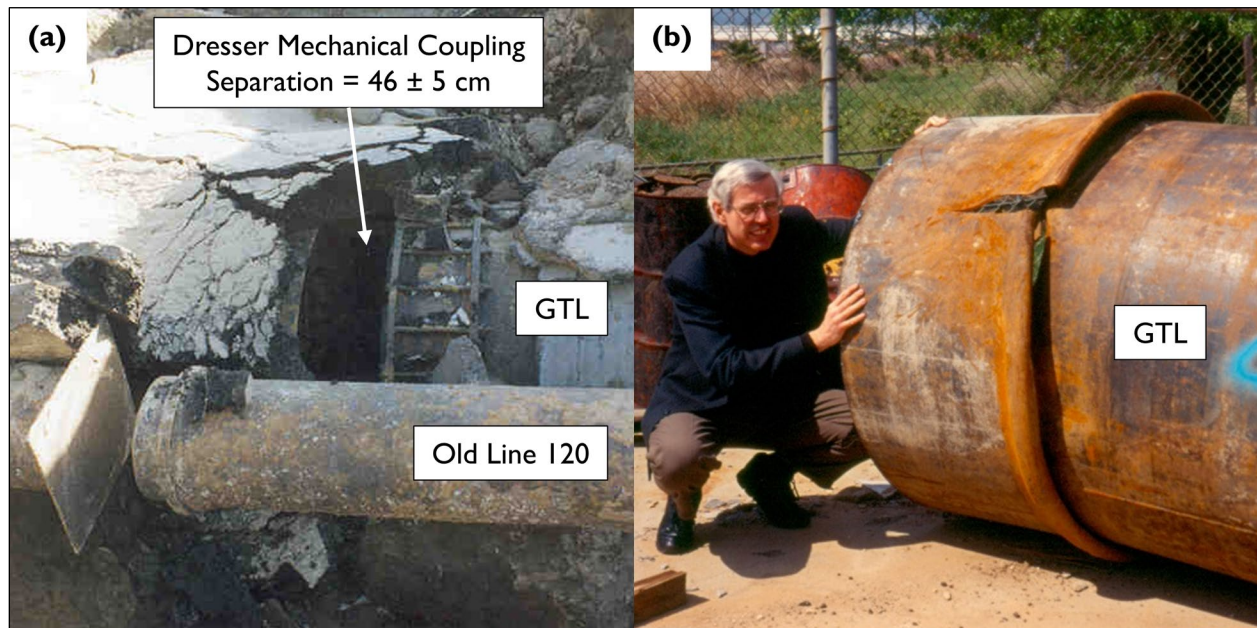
Granada Trunk Line (GTL) Failures: (a) Pullout of a Dresser Mechanical Coupling 46 ± 5 cm in the Tensile Deformation Zone and (b) Compressive Failure of a Welded Slip Joint in the Compressive Deformation Zone
